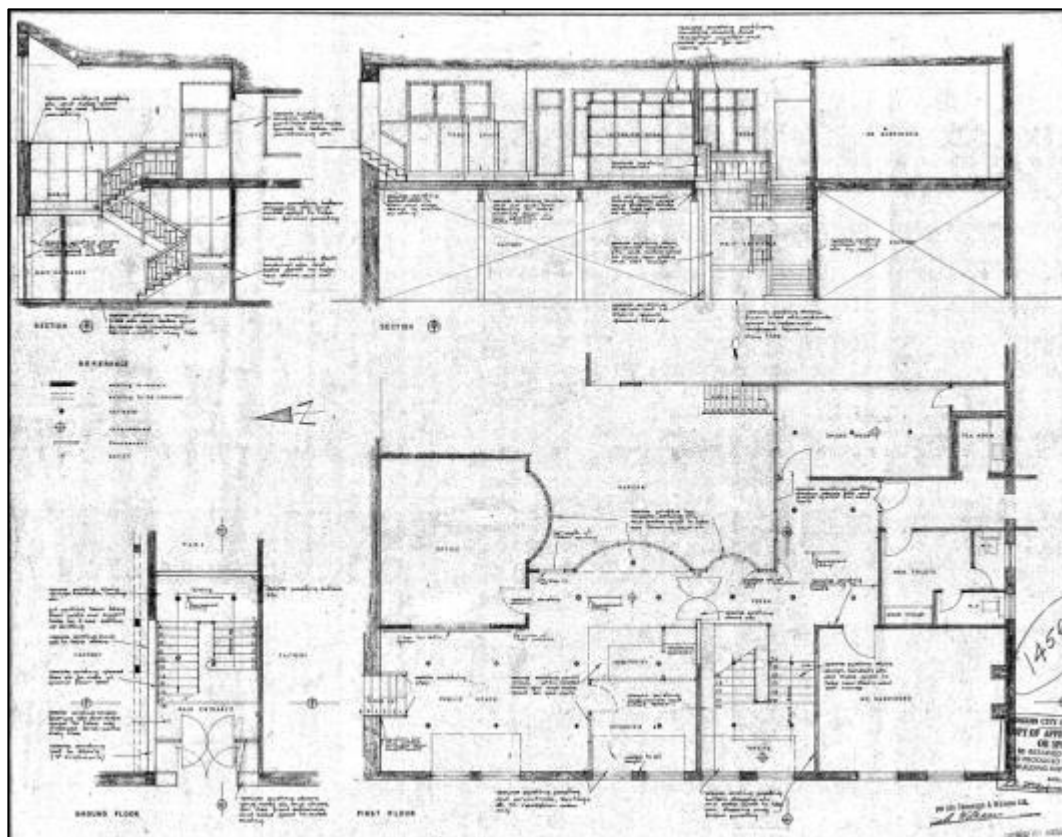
Plans by Stevenson and Williams showing the existing offices in 1966 to the first floor offices in the Dairy and Machine House Building (DCC Archives)
